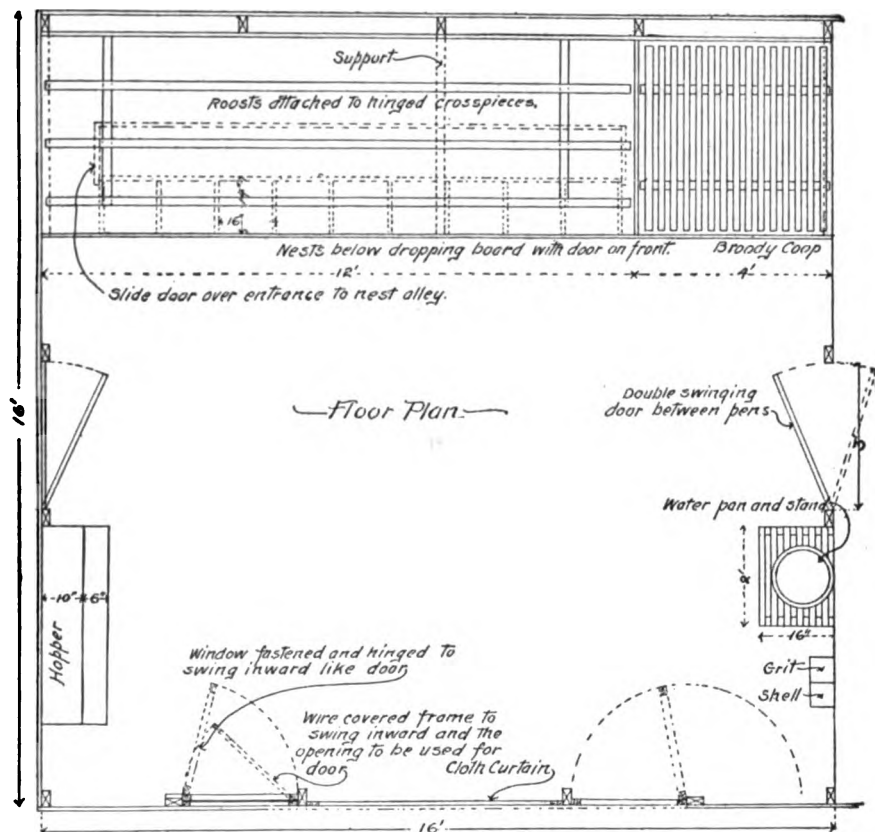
Floor plan and interior arrangement of the Cornell poultry house with pens 16 feet square
